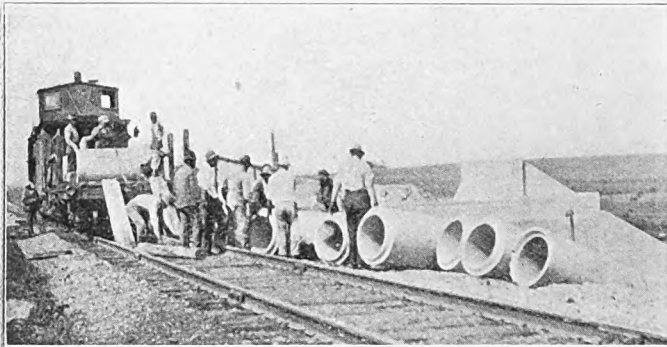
Unloading Concrete Pipe Near Delmar Jct., Second Track Work, C., M. & St. P. Ry.
